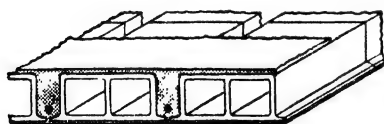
Dentile Floor (Reinforced in one Direction).
